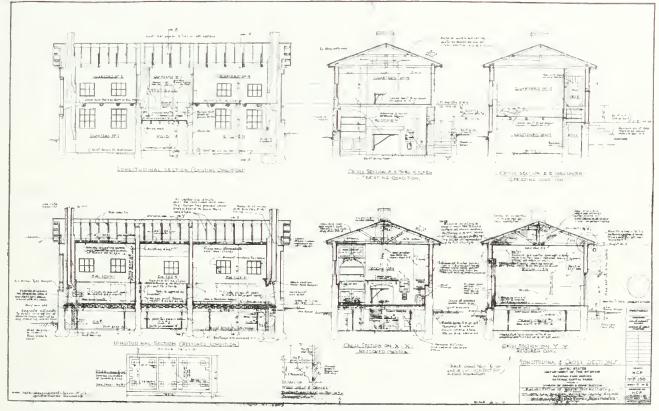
1960 section drawing depicting the NPS intention to restore the North Dependency interiors to single story spaces with a summer kitchen, living quarters, and entrances on grade. The existing plans are shown above and the proposed restoration plans are below.
